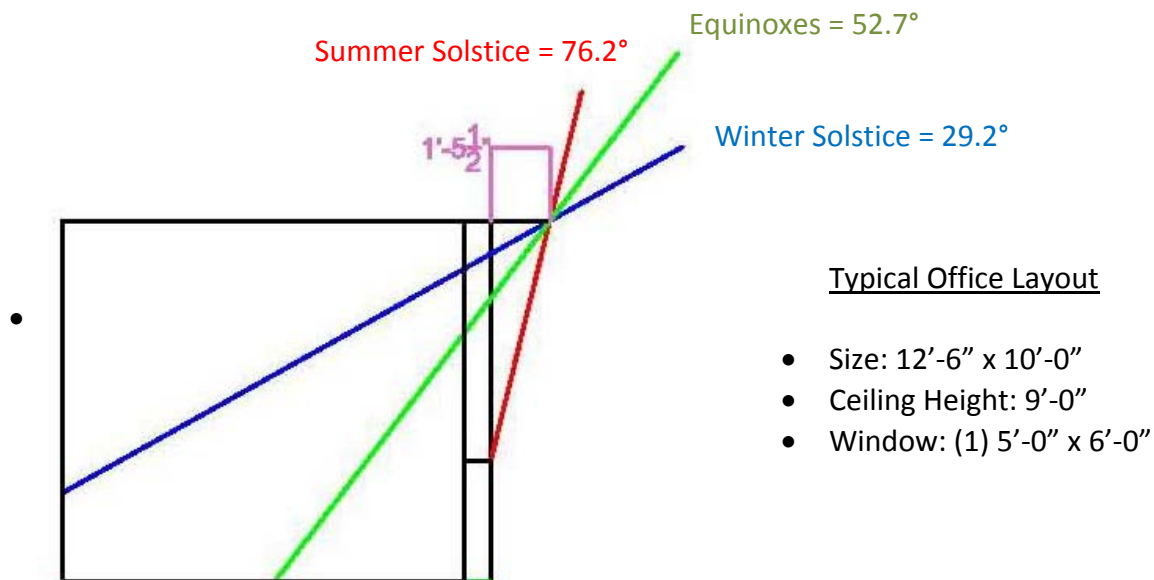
Sun Angles through Typical Office Space in Rogers Hall
